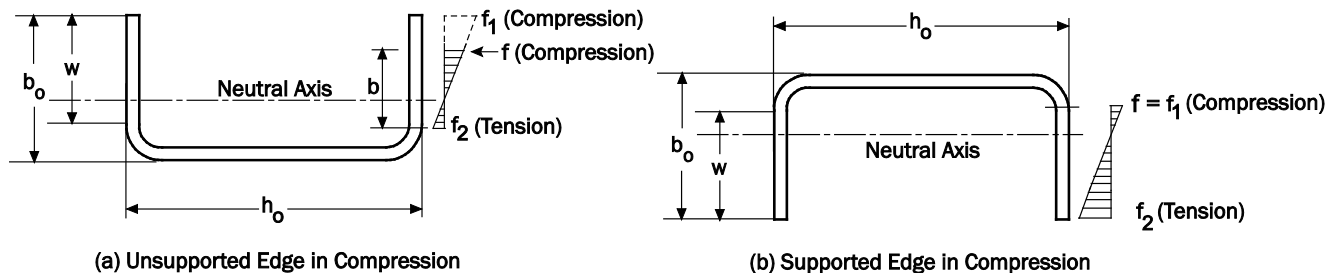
Unstiffened Elements of C-Section Under Stress Gradient for Alternative Methods
